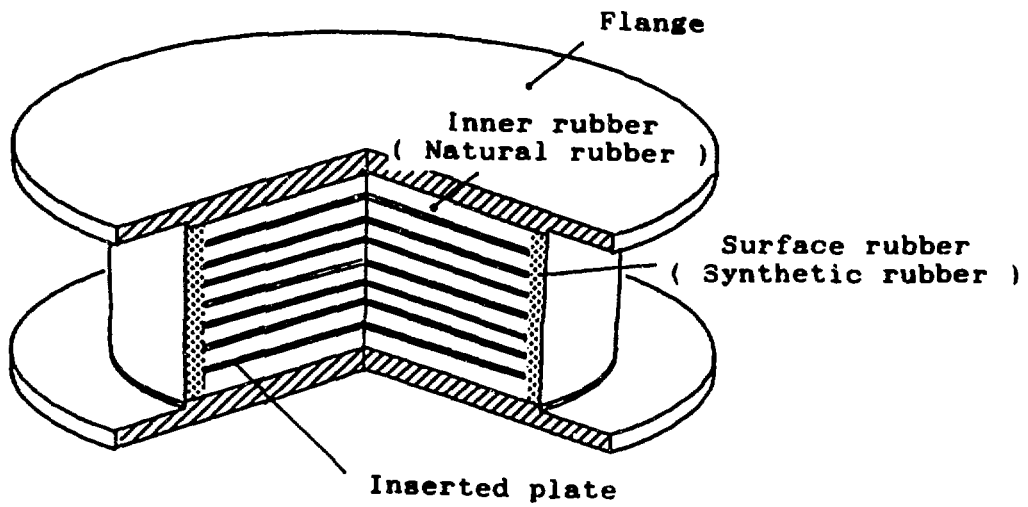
Rubber Bearing Structure for Protection Against Aging
